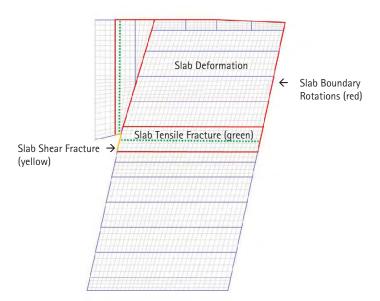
Assumed energy dissipation modes and locations (slab boundary rotations on southern boundary of floor failure only included where full-depth trench headers not present)
